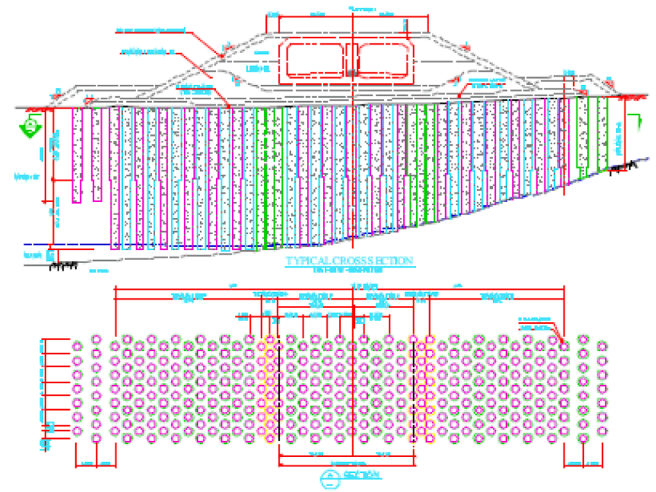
Typical Sand Compaction Pile Layout for the subsea embankment.
